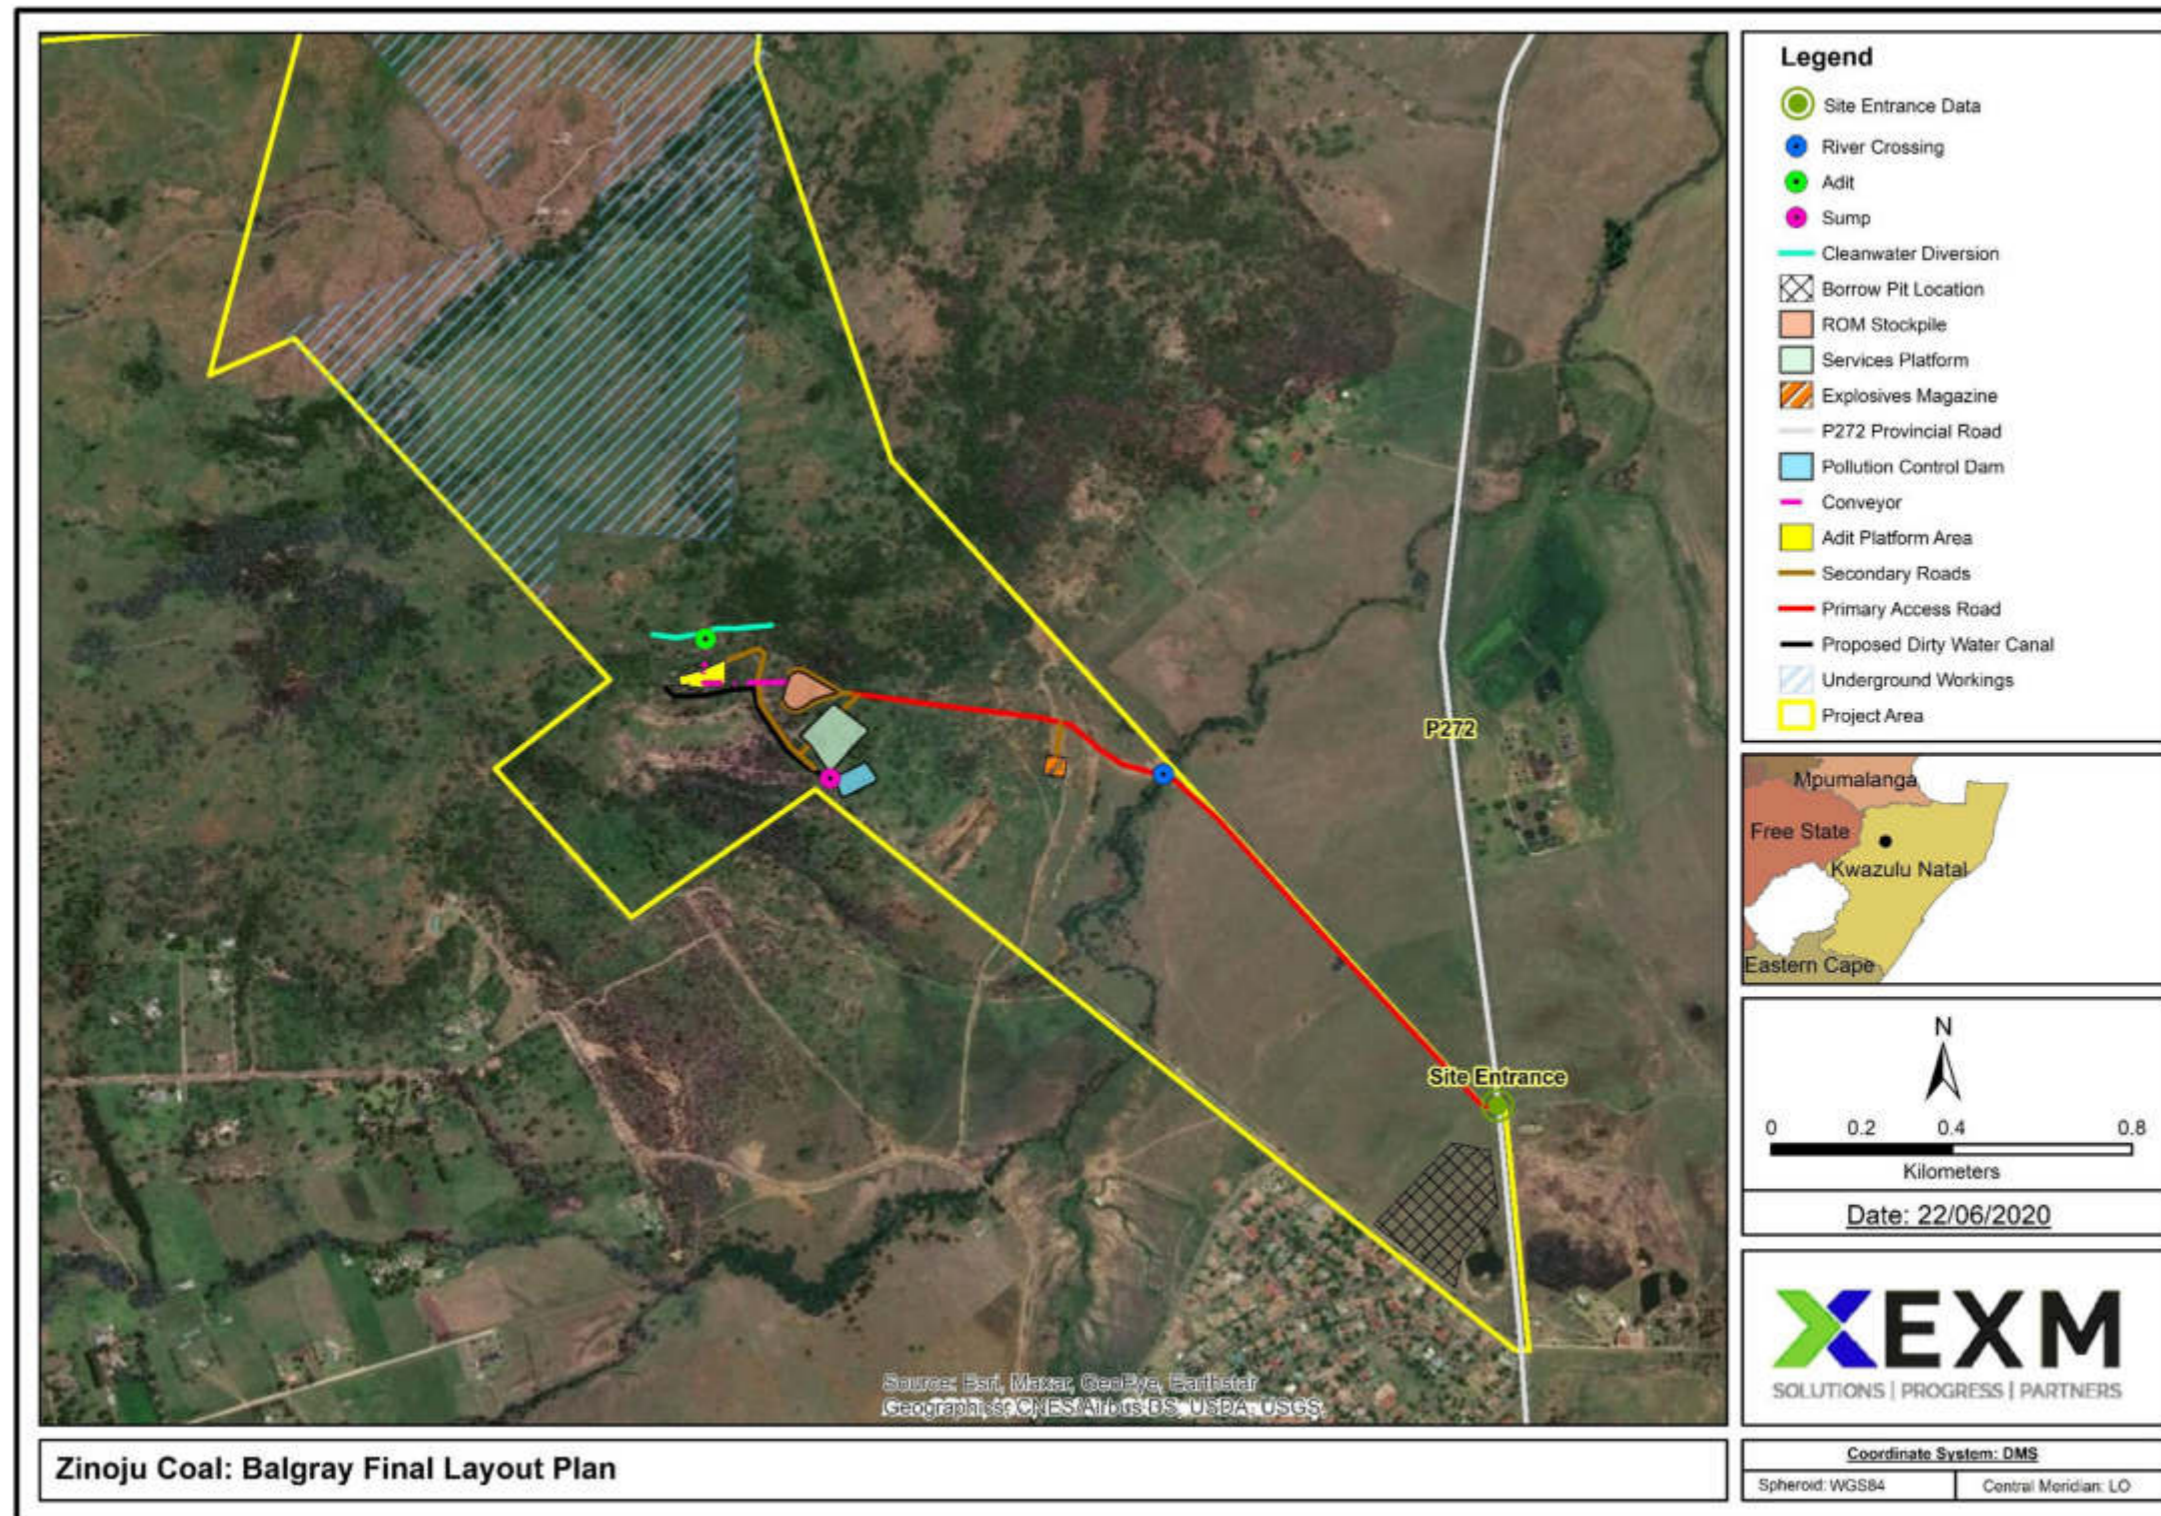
FINAL SITE LAYOUT PLAN
